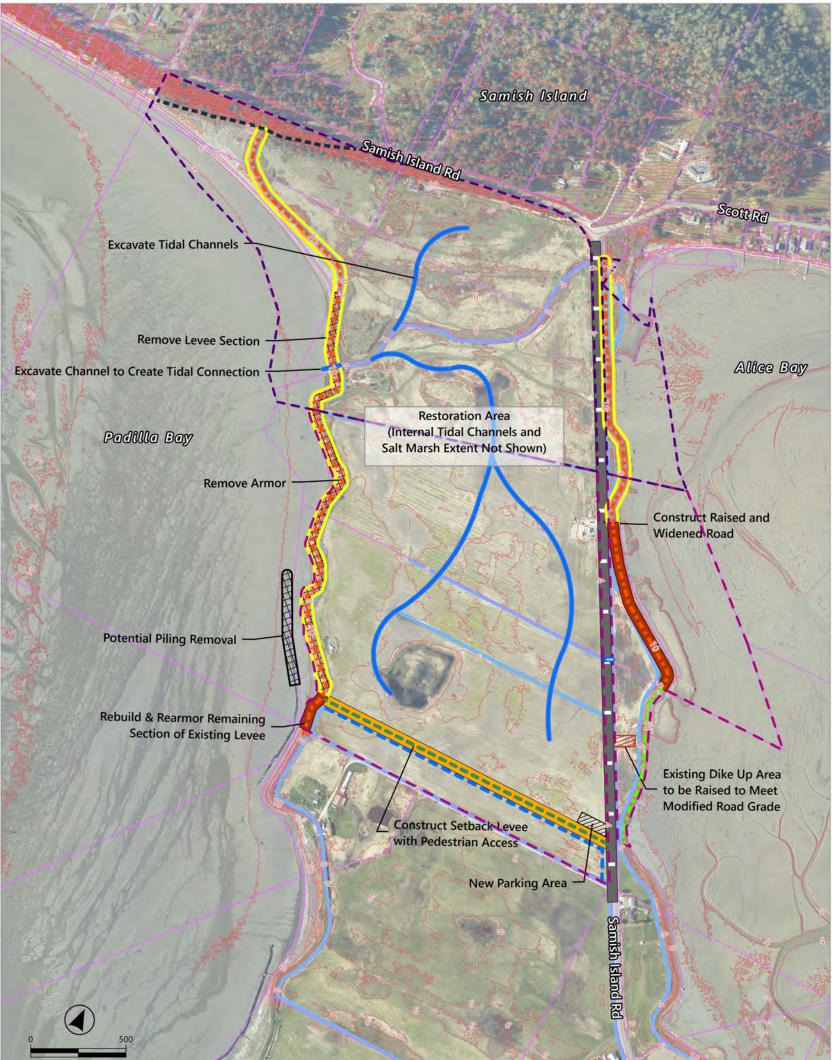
Restoration Concept 2a for a small barrier embayment.
